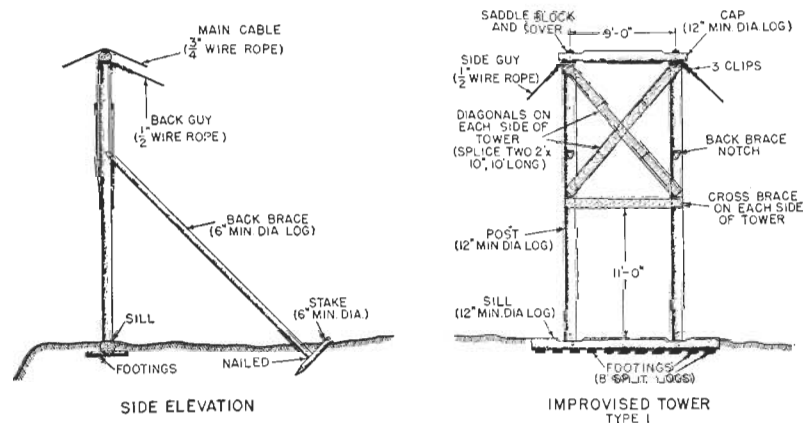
Improvised tower type-1 for suspension foot-bridge. Used on long spans when dimension lumber is available.
